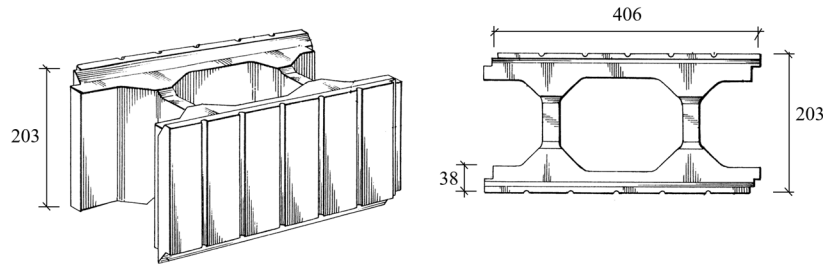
AZAR Block, isometric and plan view (units: mm) [Source: Drysdale 2000, recreated with permission].
